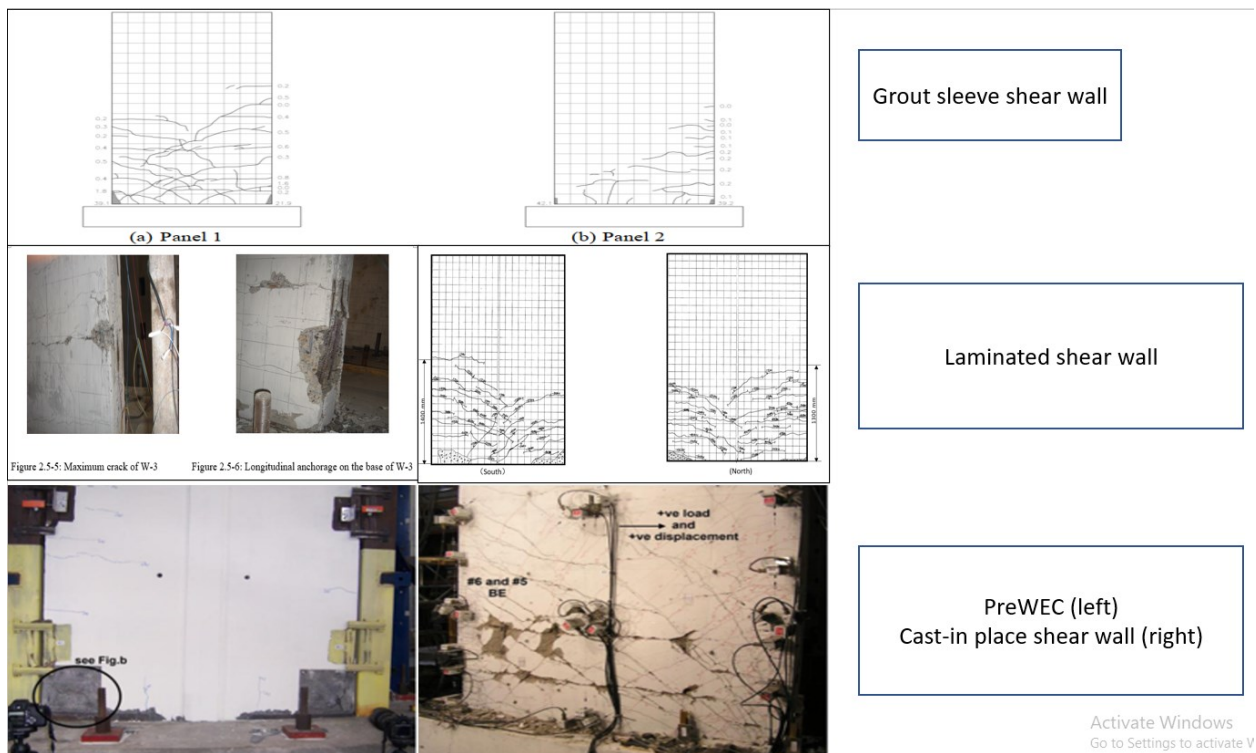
Comparison of the damage on shear wall, cast-in-place shear wall, laminated shear wall, unbonded post-tension shea wall, and PreWEC.
